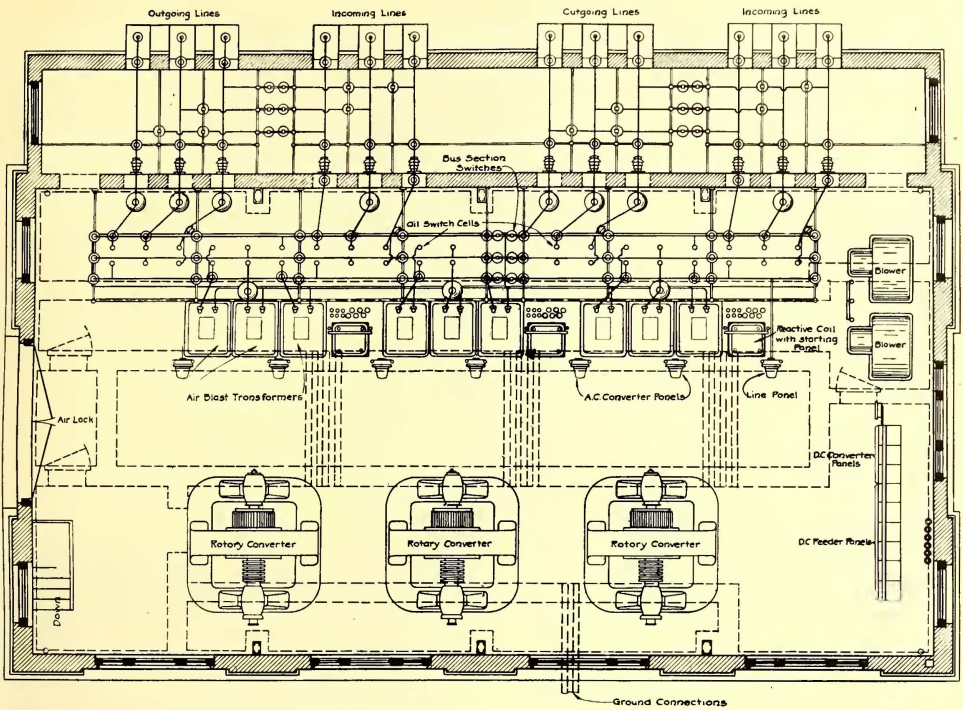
PLAN OF TYPICAL SUB-STATION
